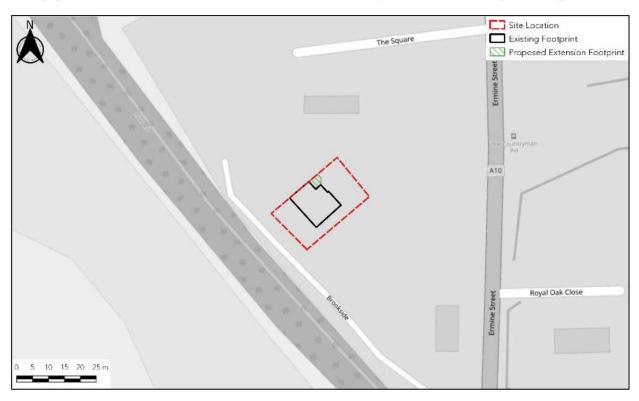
Site Location (Source: OpenStreetMaps © Contains public sector information licensed under the Open Government License v3.0)
